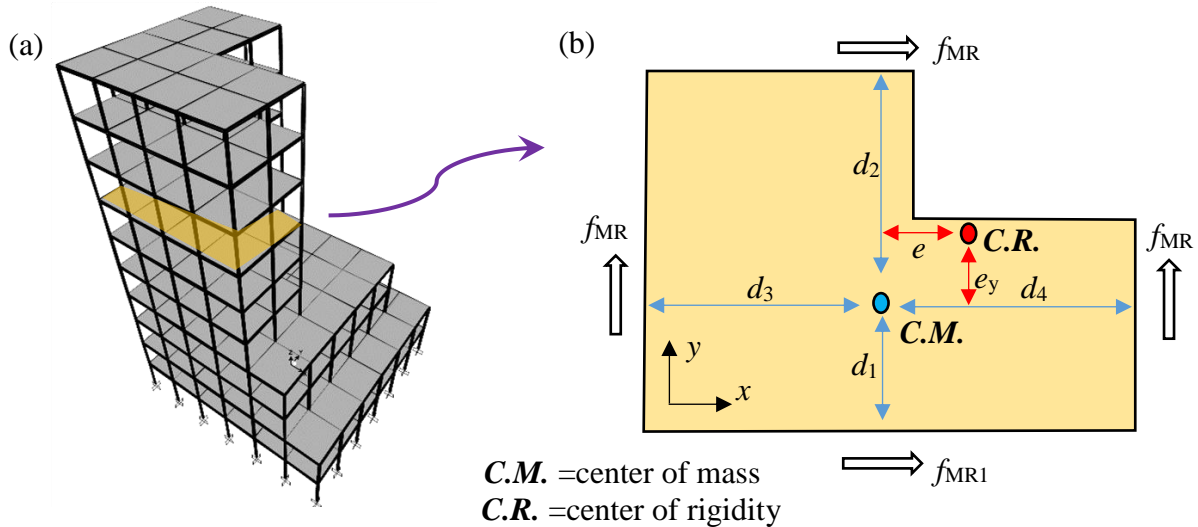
Dynamic system retrofitted with MR dampers: a) overview of a highly-irregular tall building and b) plan view of a representative floor with MR dampers
